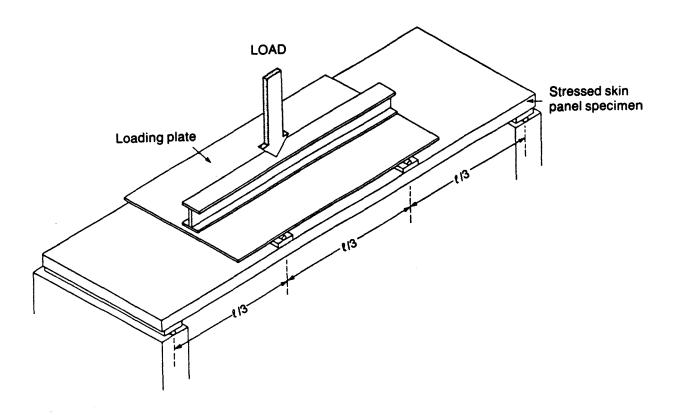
Load test arrangement for short-term and long-term testing of stressed skin panels.
